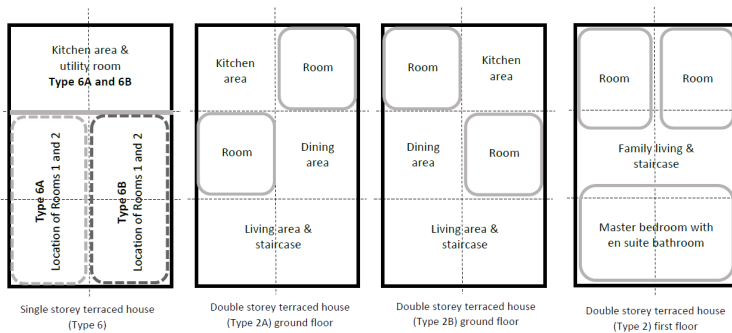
Typical internal layouts for single and double storey terrace house based on the survey
